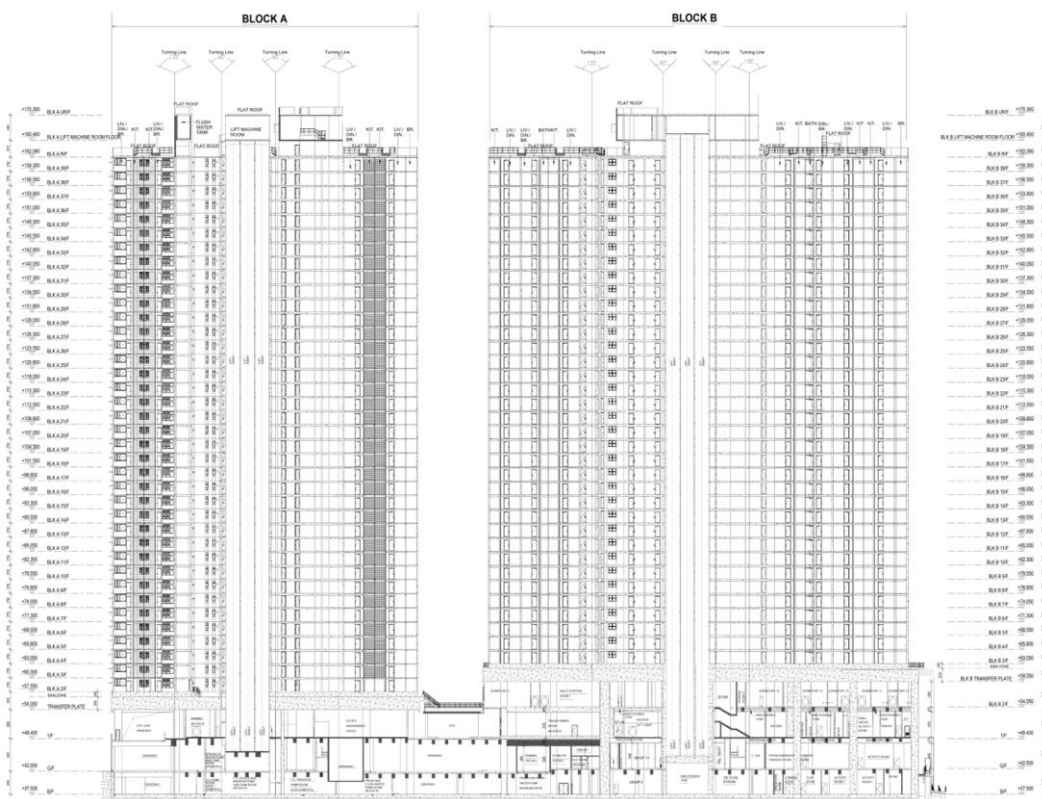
Indicative Plan of Proposed Scheme – Section
